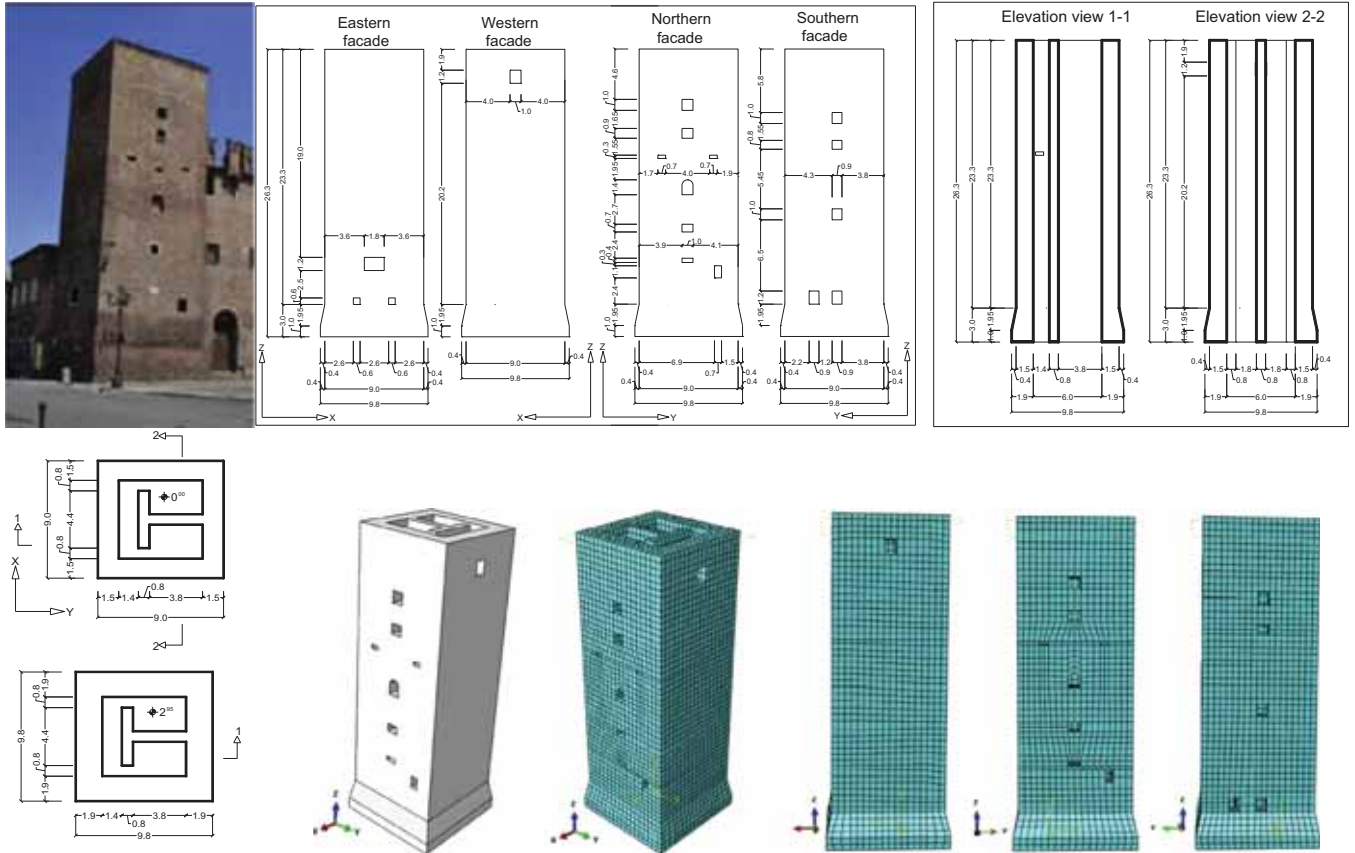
Tower IV, maistra tower of Praetorian palace.
